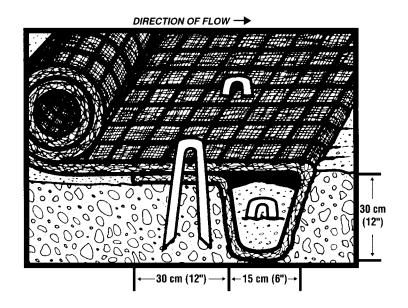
Initial Anchor Trench for Blankets and Mats
